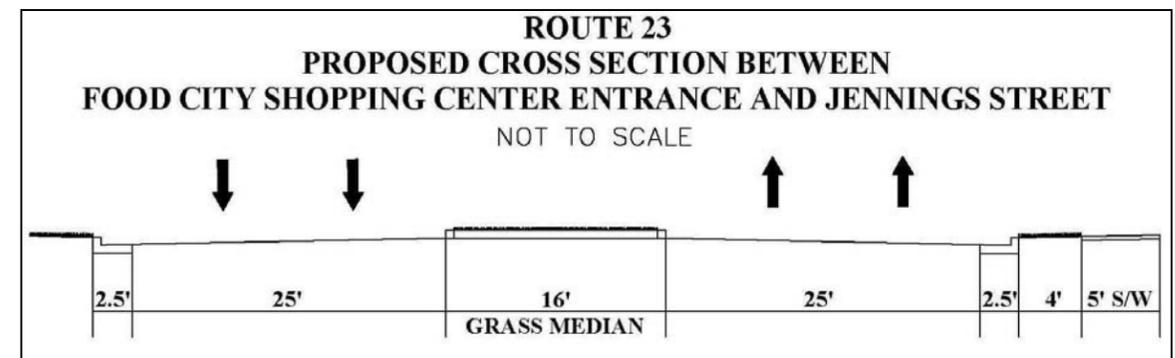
Proposed Cross Section Between Food City Shopping Center Entrance and Jennings Street
